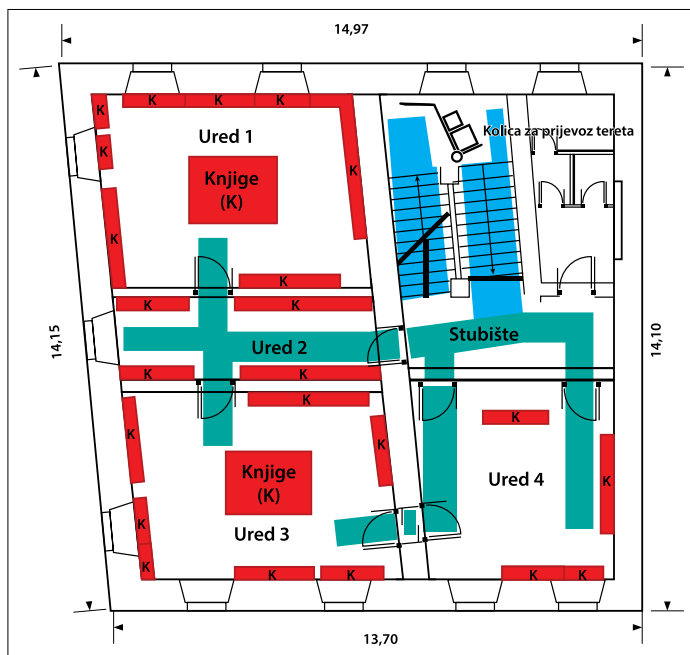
Ground plan of the Collection of old and rare books on the first floor of the Bassegli-Kaboga palace (Source: Suton 2020)
